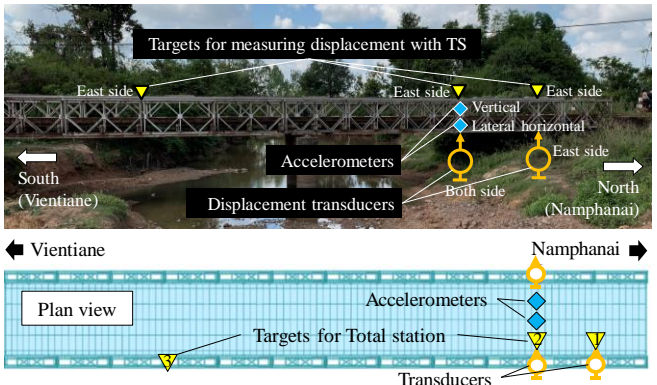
Measurement plan for Bridge C: continuous two-spans with double panel
